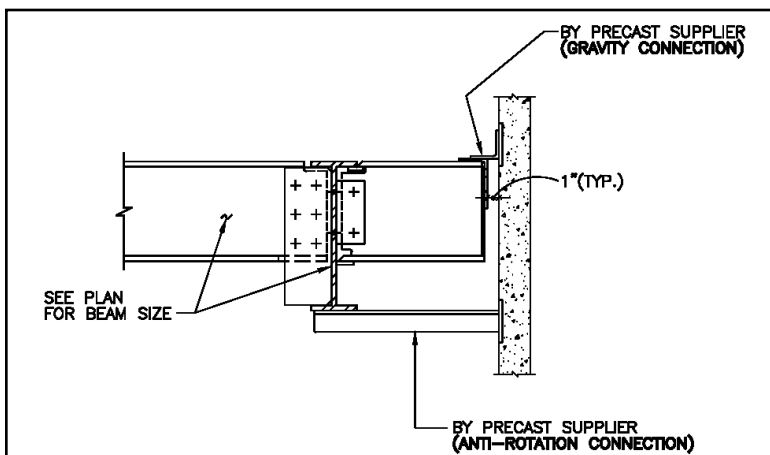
Typical gravity and anti-rotation connections in a steel-framed building
